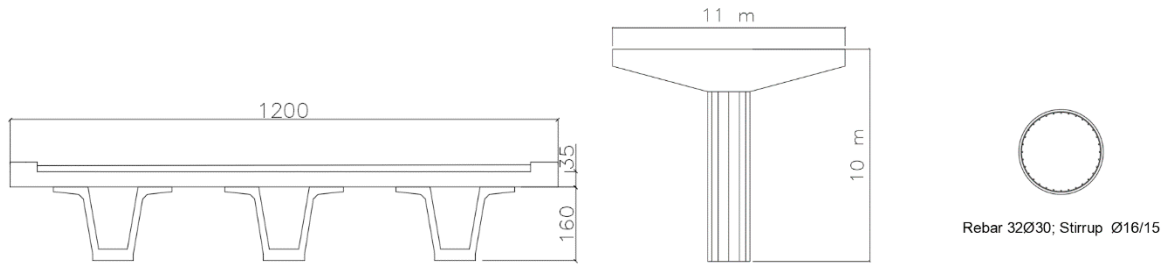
V-shape deck section on the left, and pier and reinforcement on the right
